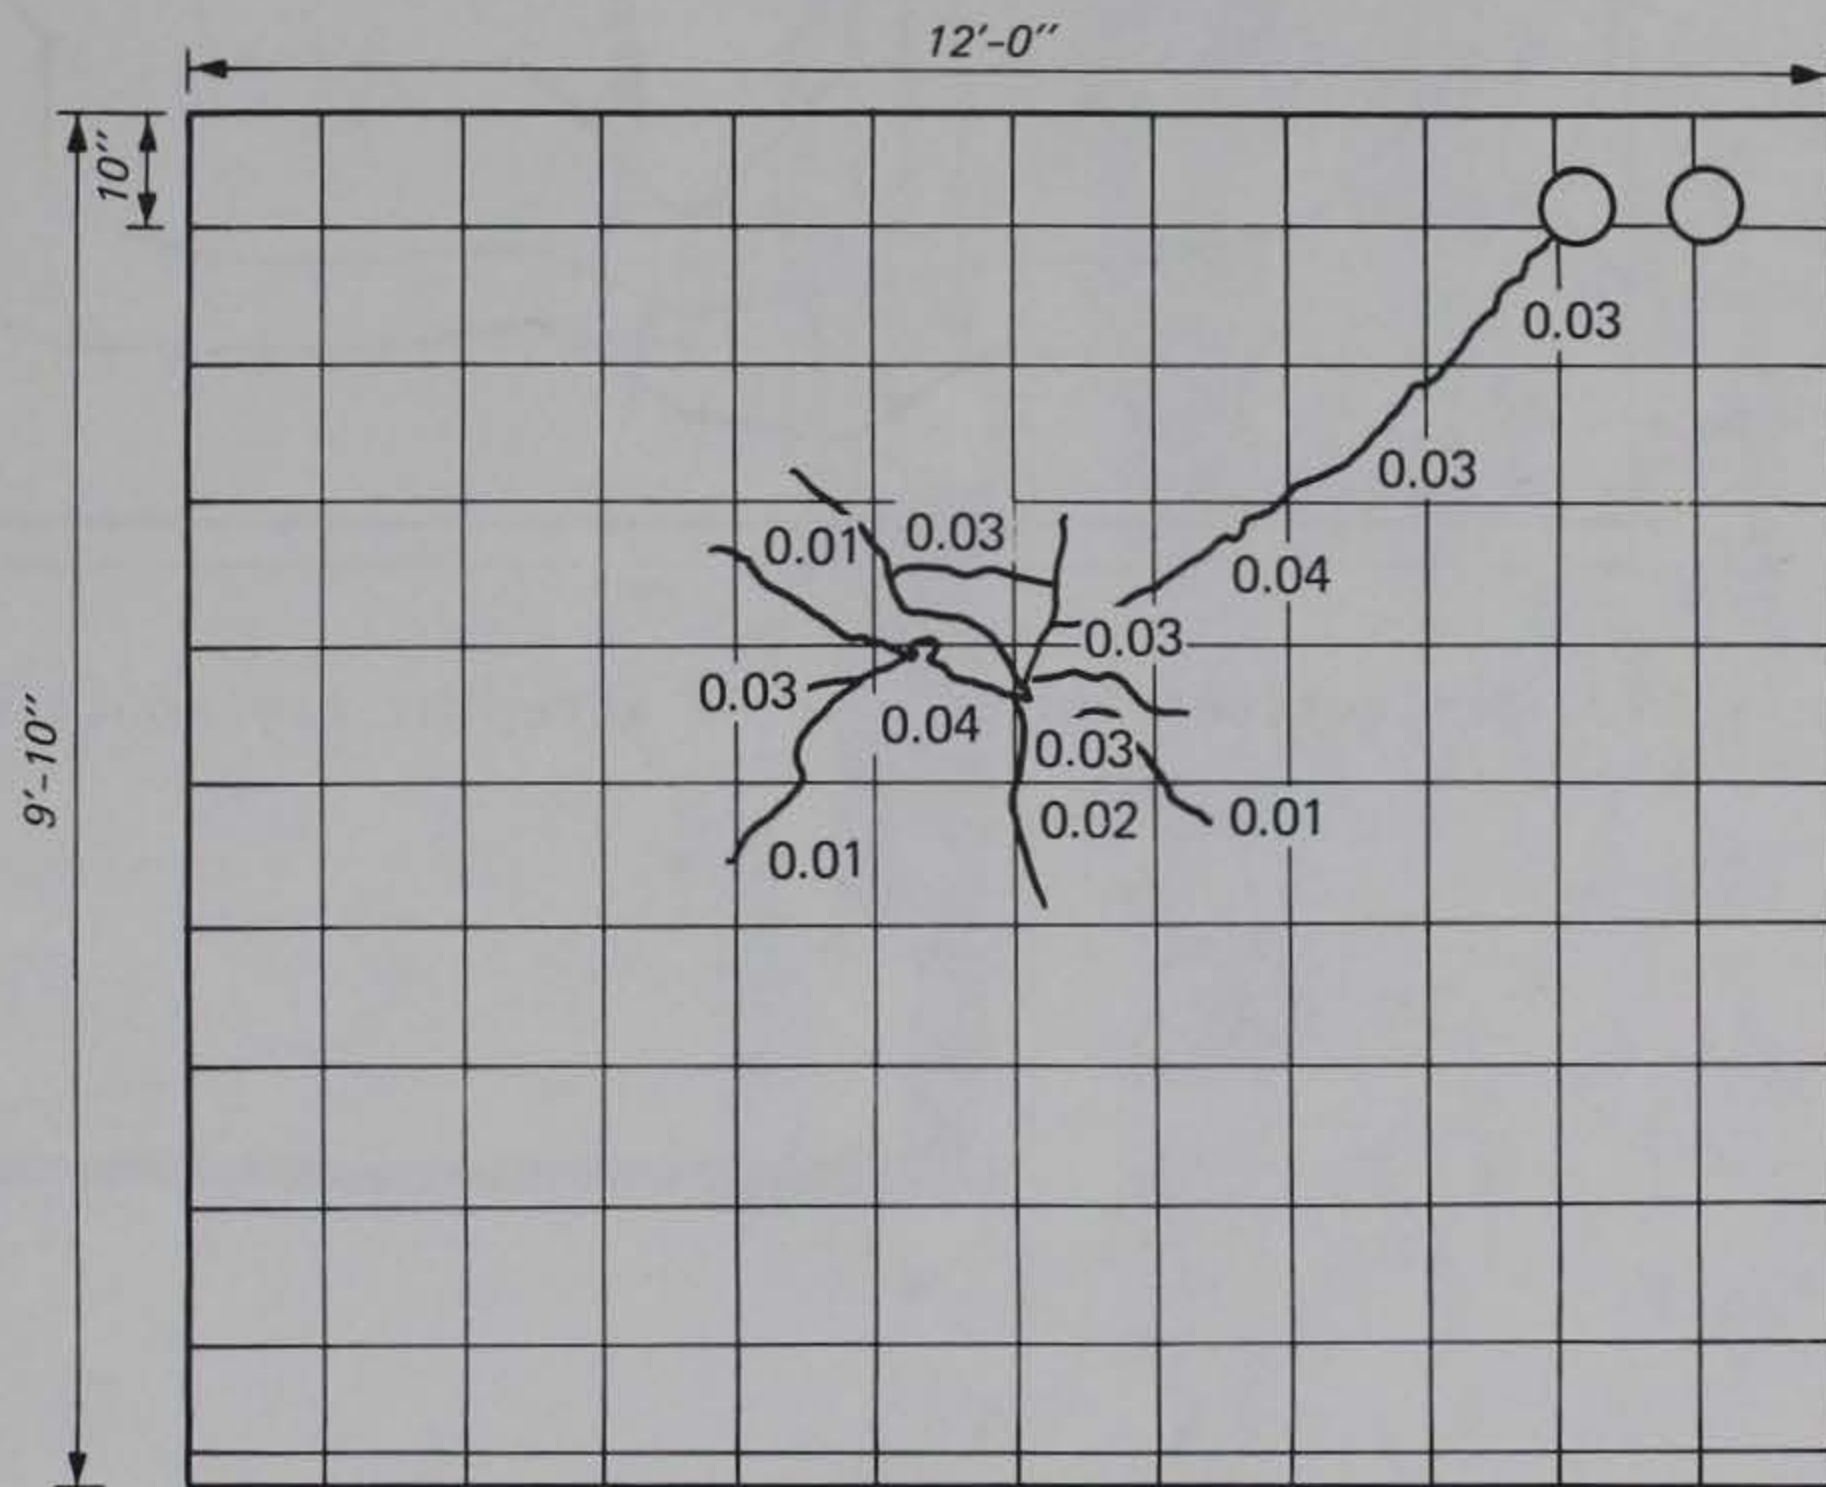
Posttest crack pattern in south acceptor bay wall.
